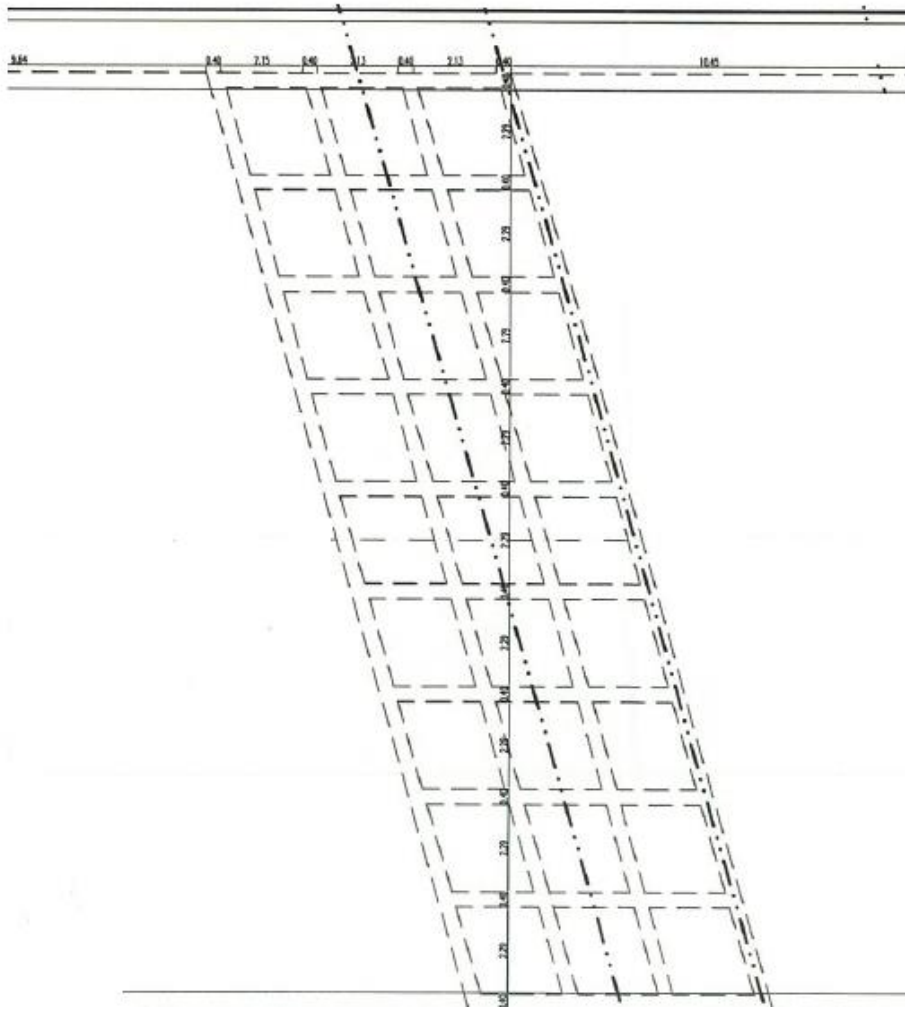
Plane of simple beam slab with characteristic dimensions
